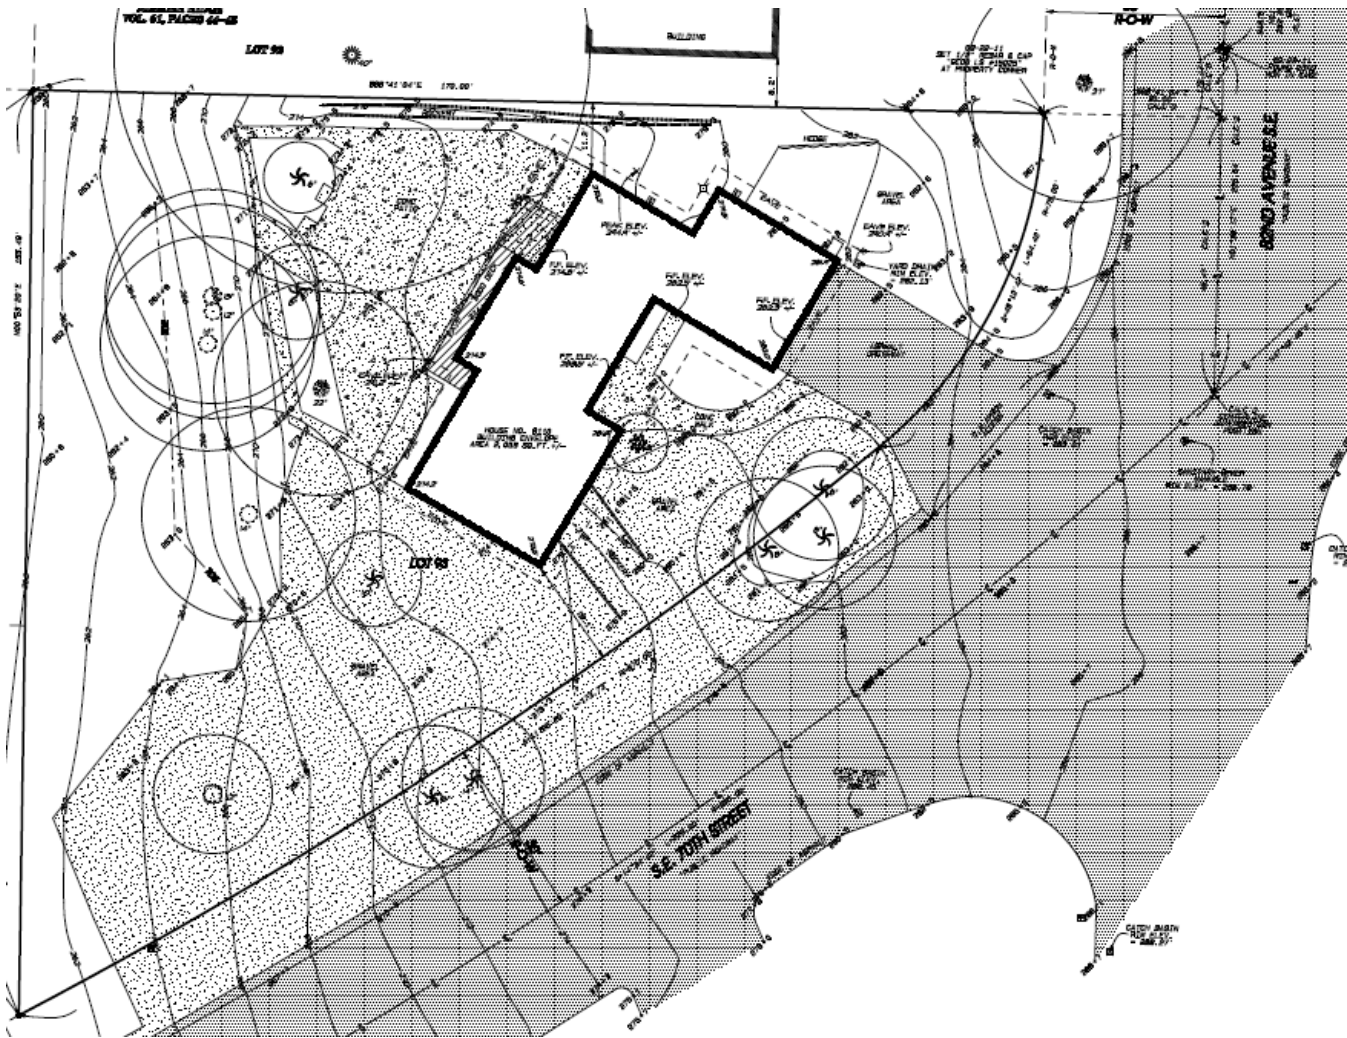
Excerpt from the survey plans showing footprint of existing house.
